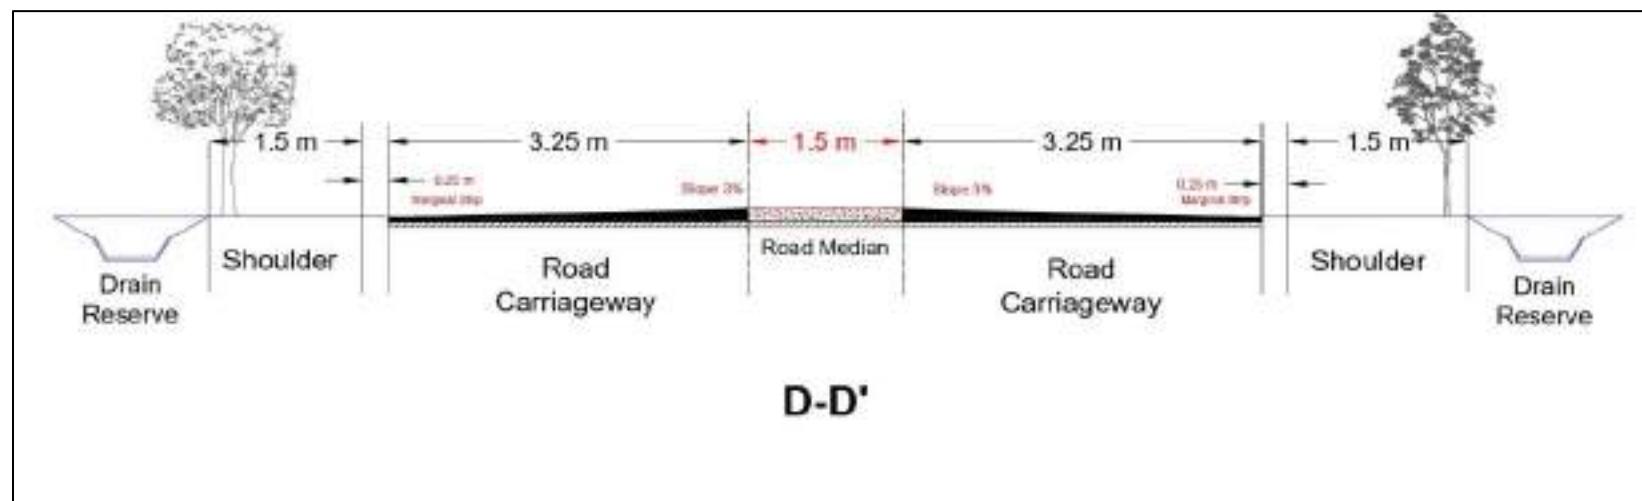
Cross Section of Minor Road (Inside Study Zone A)
